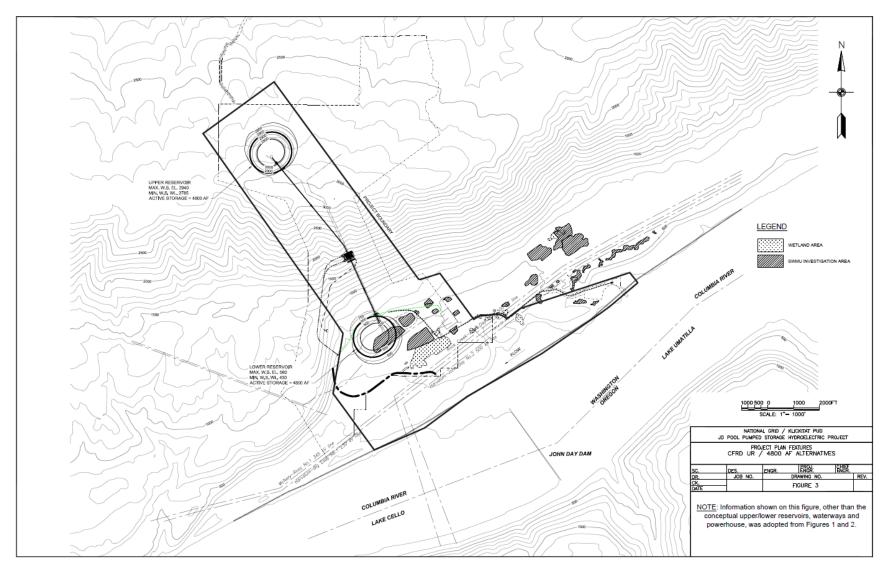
Goldendale Energy Storage Project General Arrangement—Alternative 3—Plan
